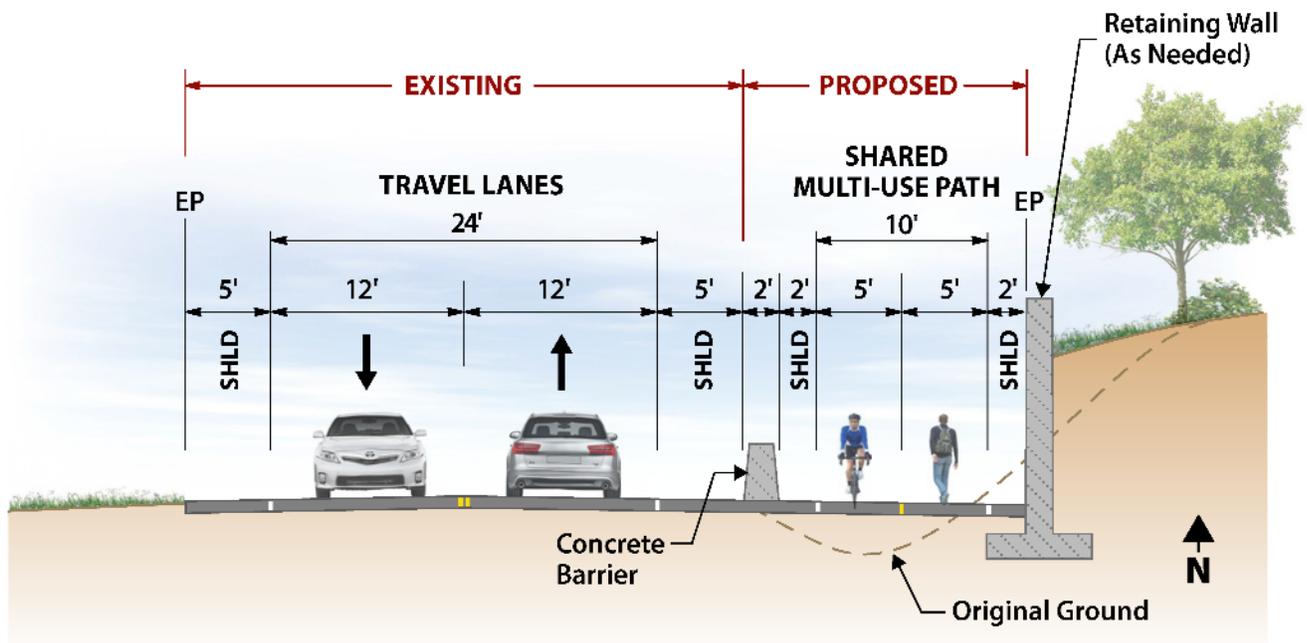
Central Avenue Between Henry Lane and North Bank Road – Alternative Alignment 2 Cross Section
